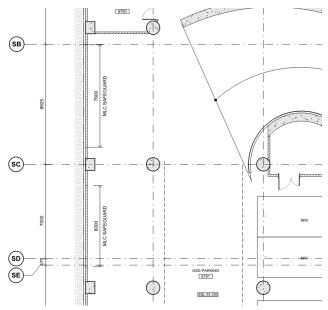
Extract of Victoria Cross Station architectural layout showing future MLC breakthrough location
